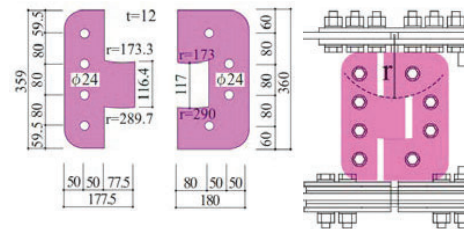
The shapes and dimensions of a pair of rotational shear plates.
